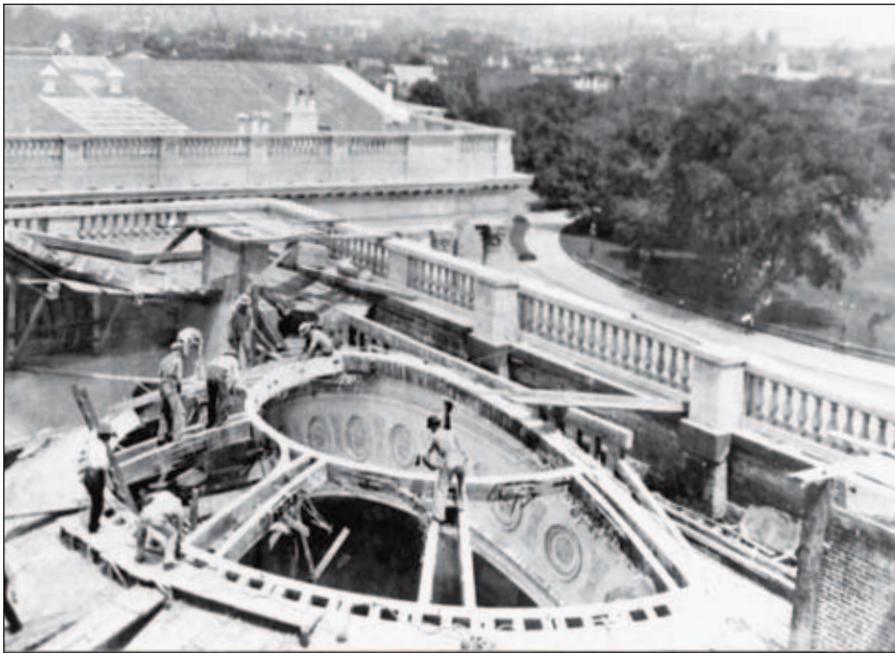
Workmen rebuilding the roof of the Supreme Court ceiling (Old Senate Chamber) in 1901.
